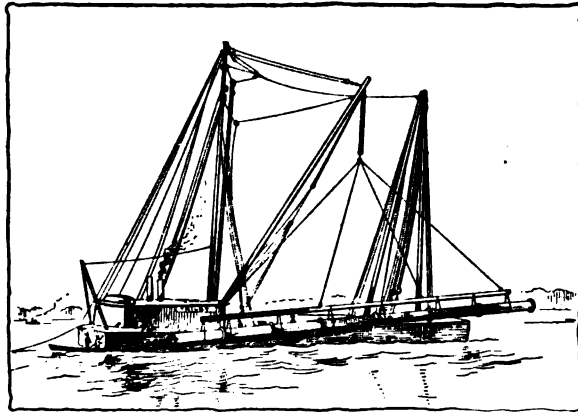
Lowering section of submerged outfall, Salem, Mass.
